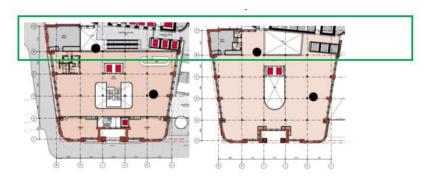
Ground floor plan (left) and Levels above ground level (right) with area of concern outlined in green
